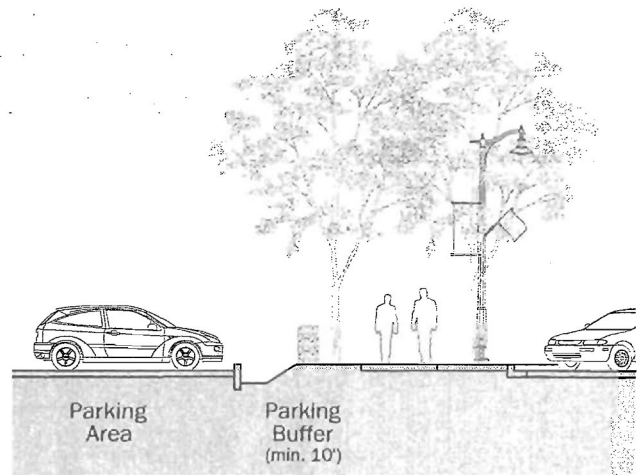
D.4: Potential design of the parking area perimeter screening landscaping, with ground level plantings, trees and shrubs. A bioswale (optional) is shown and may be included in the perimeter screening.
